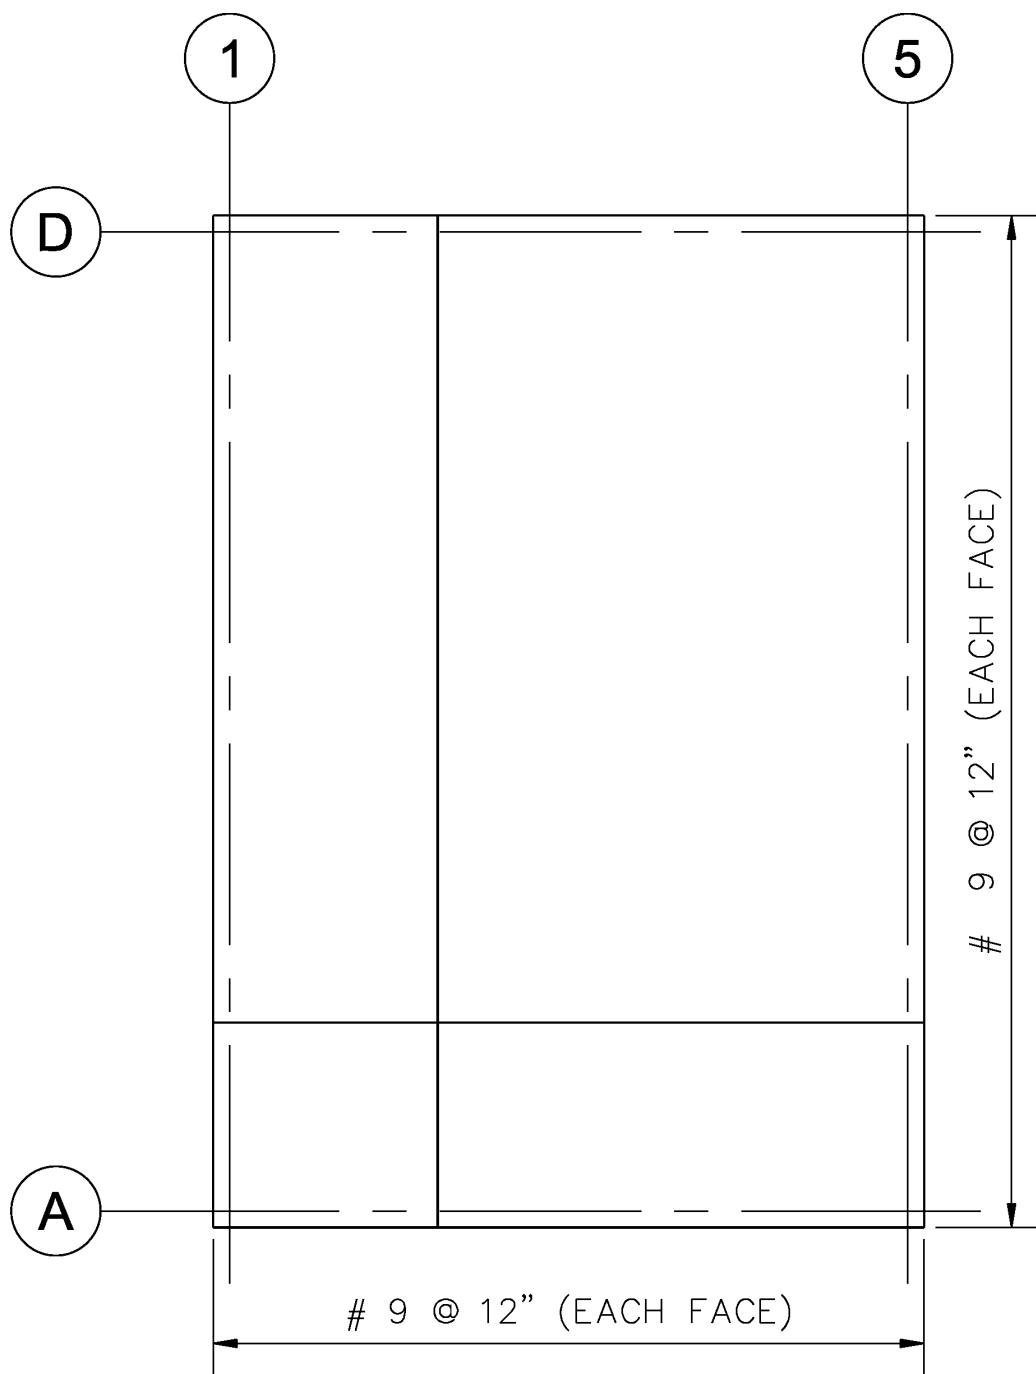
E.4-2—{Grade Slab Plan for the UHS Makeup Water Intake Intake Structure at Elevation 270'-0" (82.30 m)}
